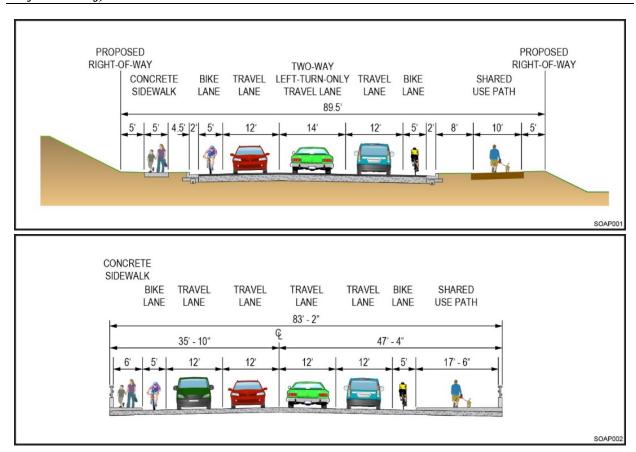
Soapstone Connector Roadway and Bridge Typical Sections
